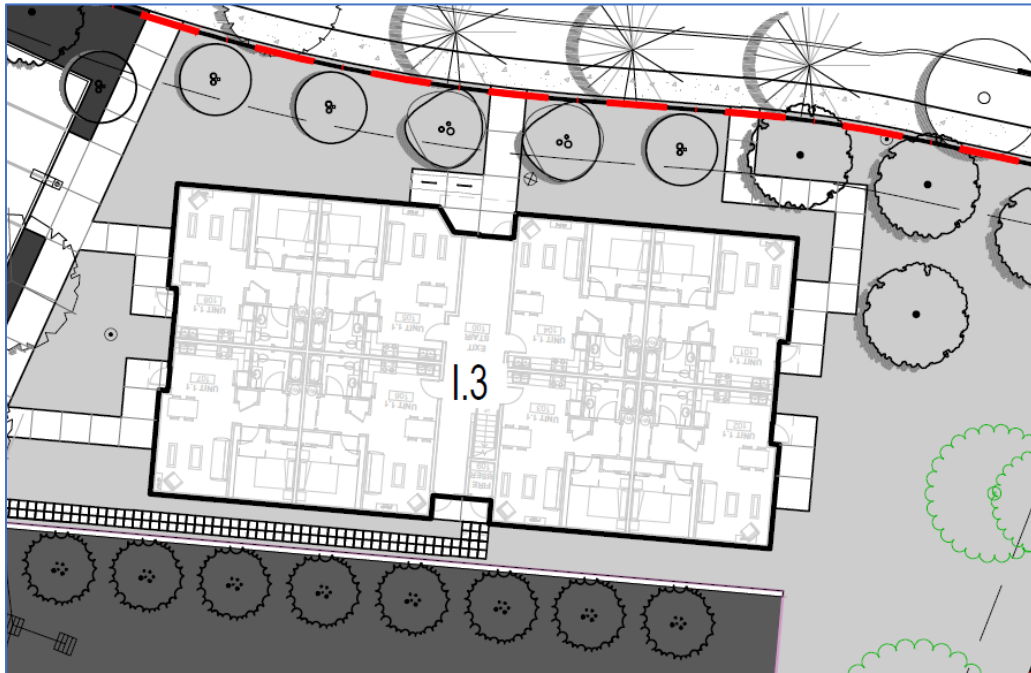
Two corner units have entrances to the side, rather than to the Salal sidewalk.
